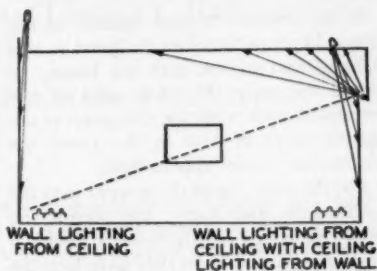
Wall and ceiling lighting methods for desired surround illumination.
